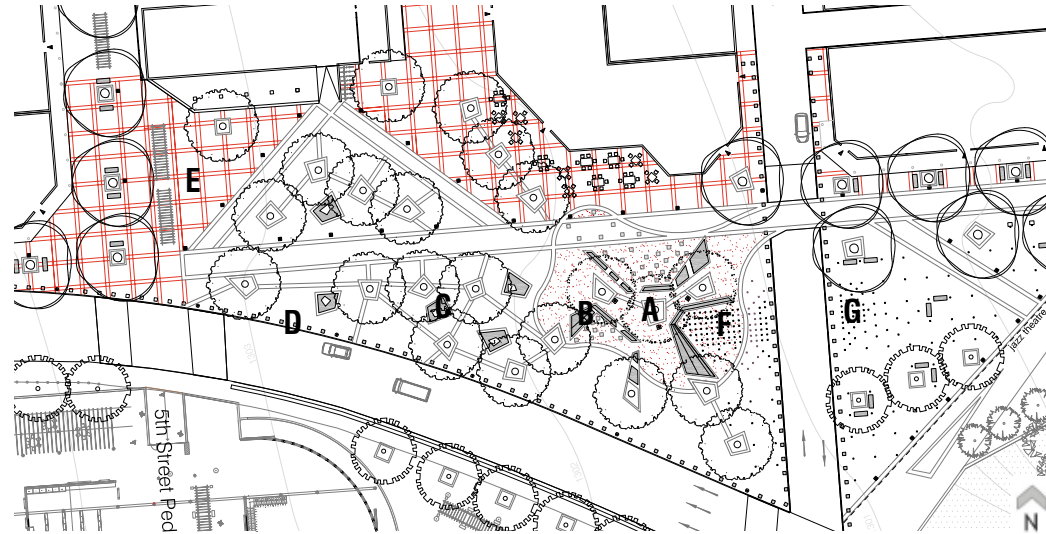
Plan indicating where physical elements of design are located (NTS Author, 2009)
